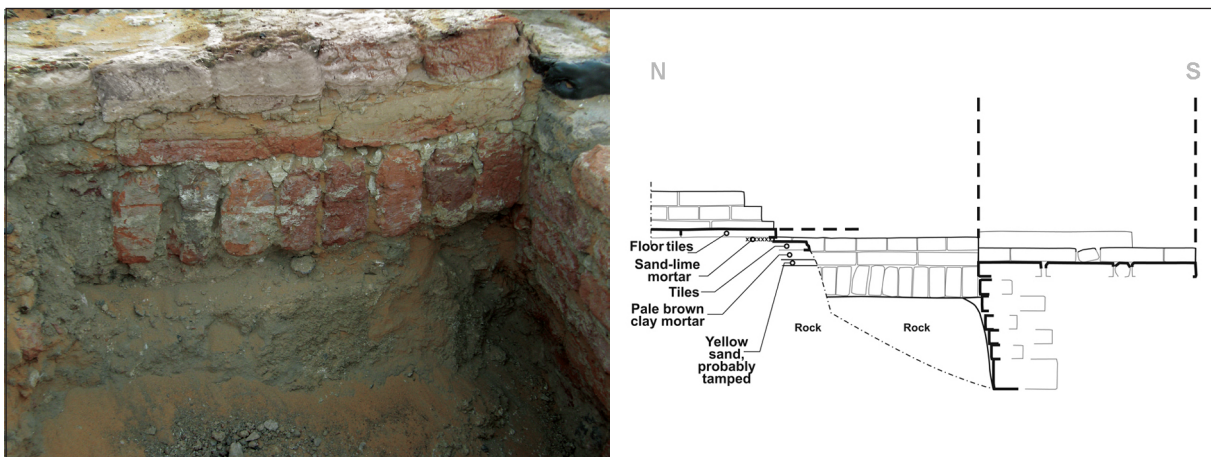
Foundations of the south and east walls in the southeastern corner of the diakonikon
